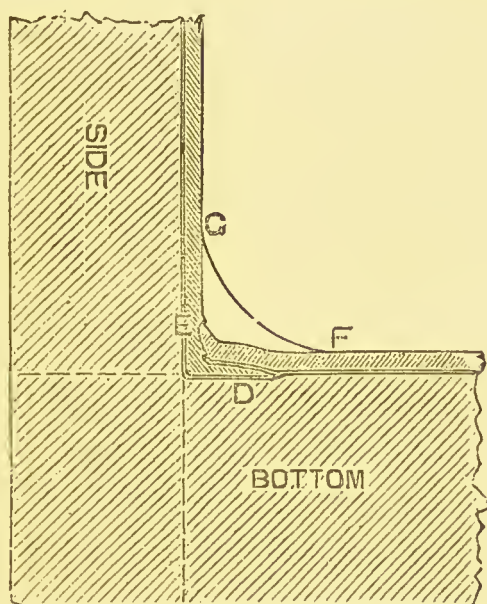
Section of Cistern Soldering. Bottom Angle.
